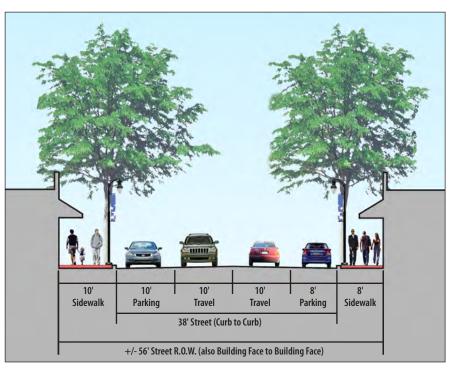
PROPOSED STREET SECTION—34TH STREET, NORTH OF BUNKER HILL ROAD, LOOKING SOUTH.
